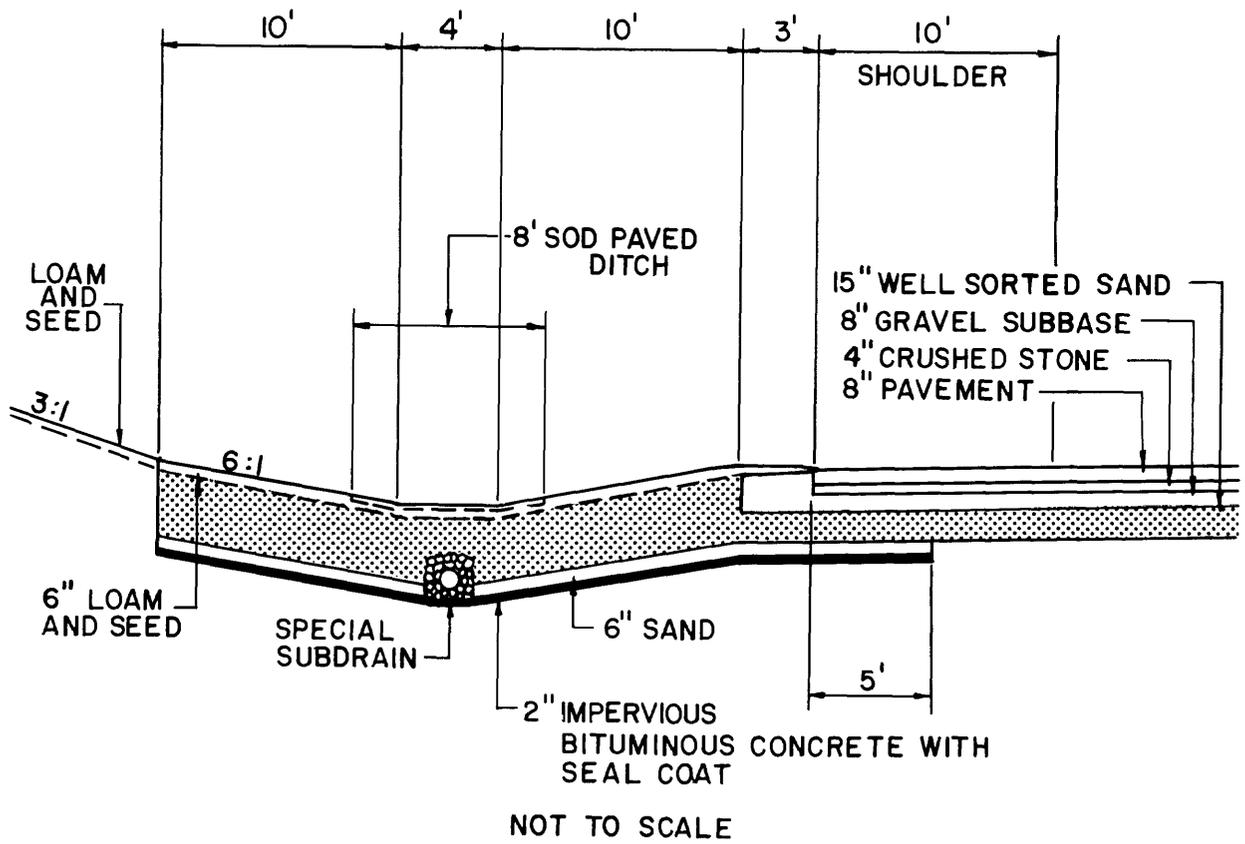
Cross section of snow berm along Route 25 in Wareham, Massachusetts.
